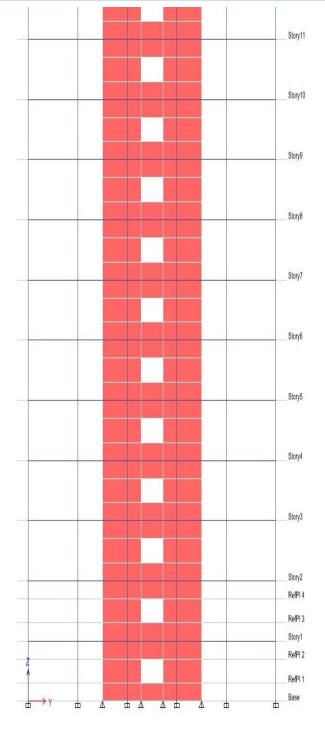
Side view showing shear wall openings of size 2 m X 1.2 m
